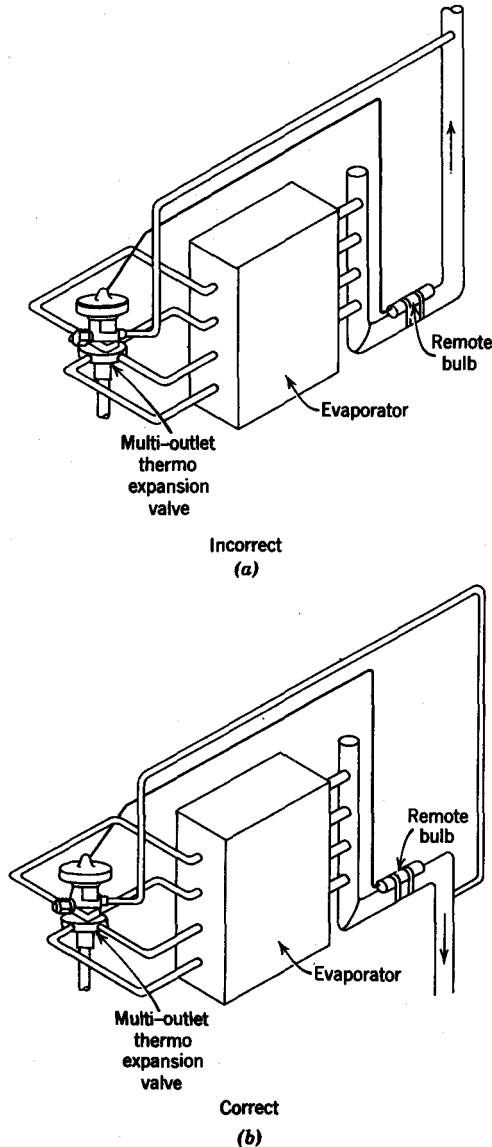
(a) Remote bulb location shown trapped. (b) Remote bulb location shown free draining. (Courtesy Alco Valve Company.)
